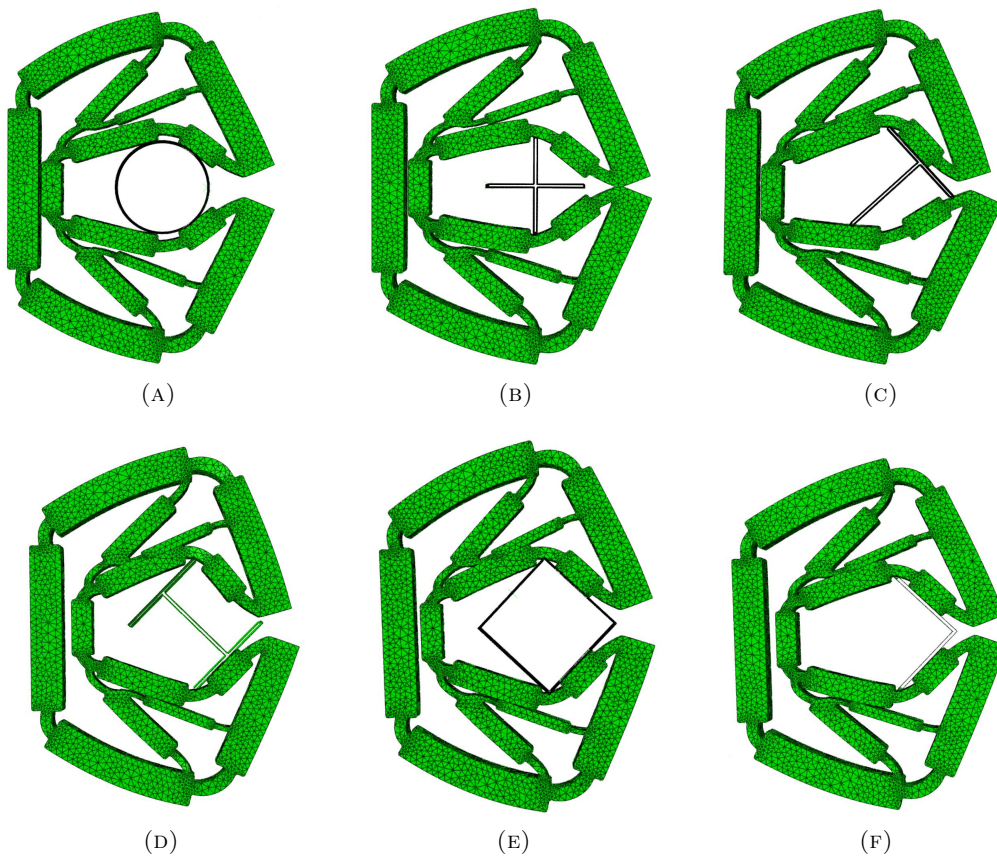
Gripper #6 grasping each of the scaled (250%) sizes of beam members in target beam member set #1 (A) Pipe Beam, (B) “+” Beam, (C) “T” Beam, (D) “T” Beam, (E) Box Beam, (F) “L” Beam.
